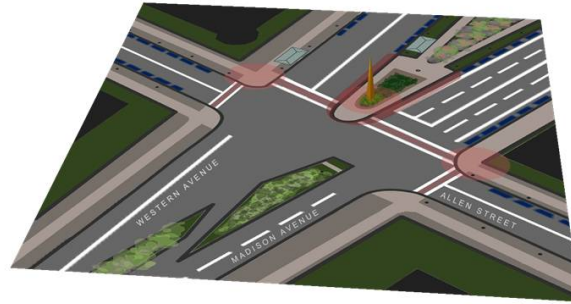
Corner sidewalk bump-out in West Hartford, CT.
